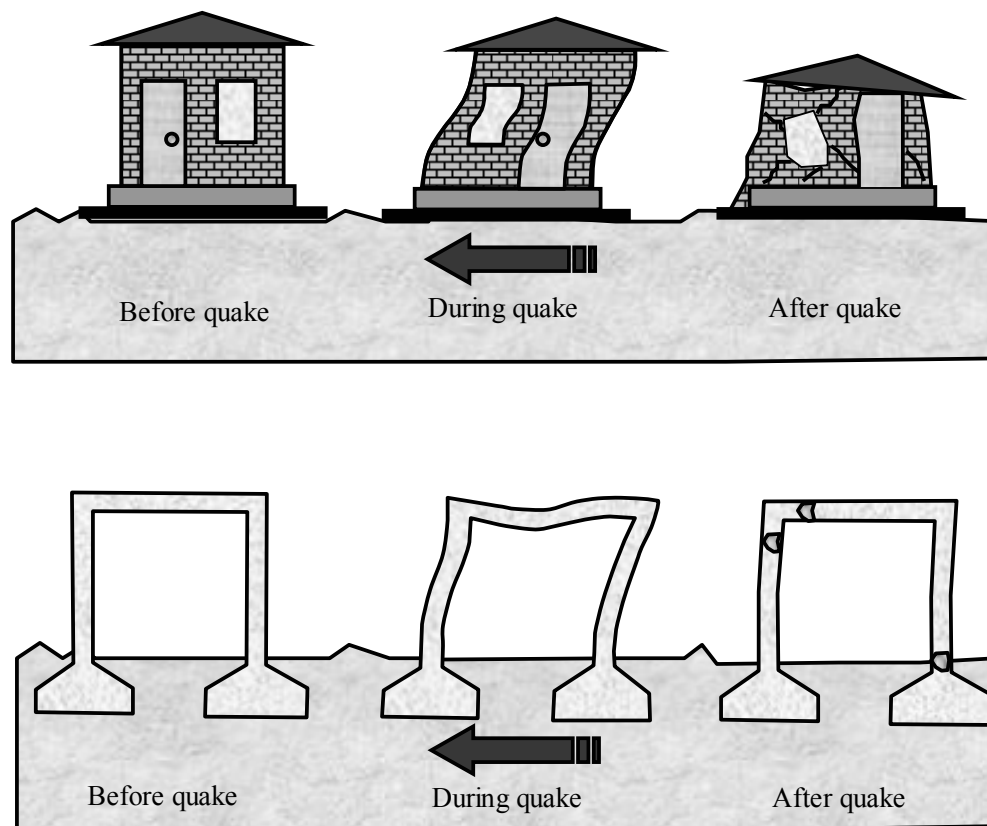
Behaviour of brittle and ductile buildings under a major earthquake (Ref. 0.16)
